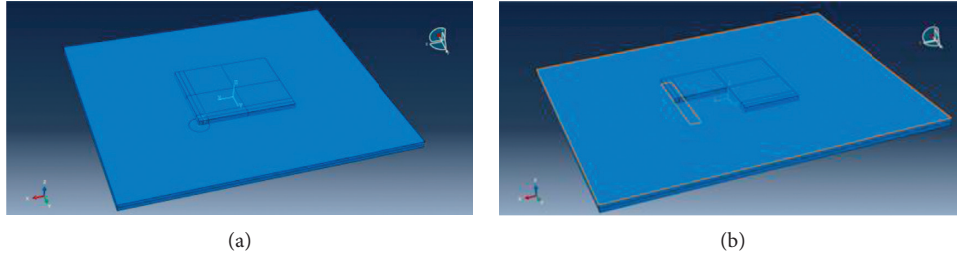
Schematic of plate angle and edge voids of the cement pavement. (a) Plate angle void of cement pavement. (b) Plate edge void of cement pavement.
